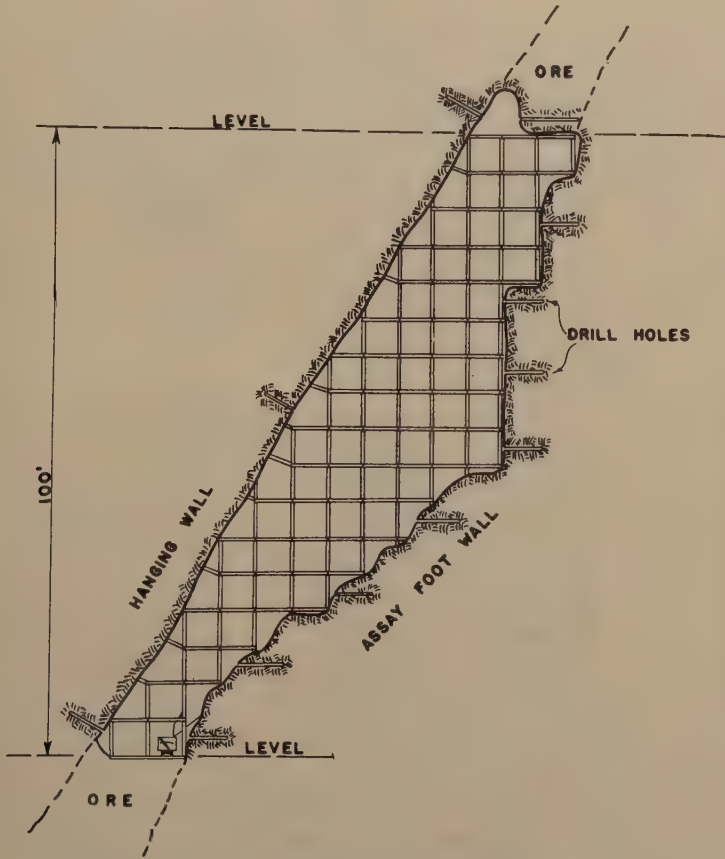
METHOD OF PROSPECTING FOOTWALL AND HANGING WALL WITH DRILL HOLES AS SLOT IS CARRIED UP.
